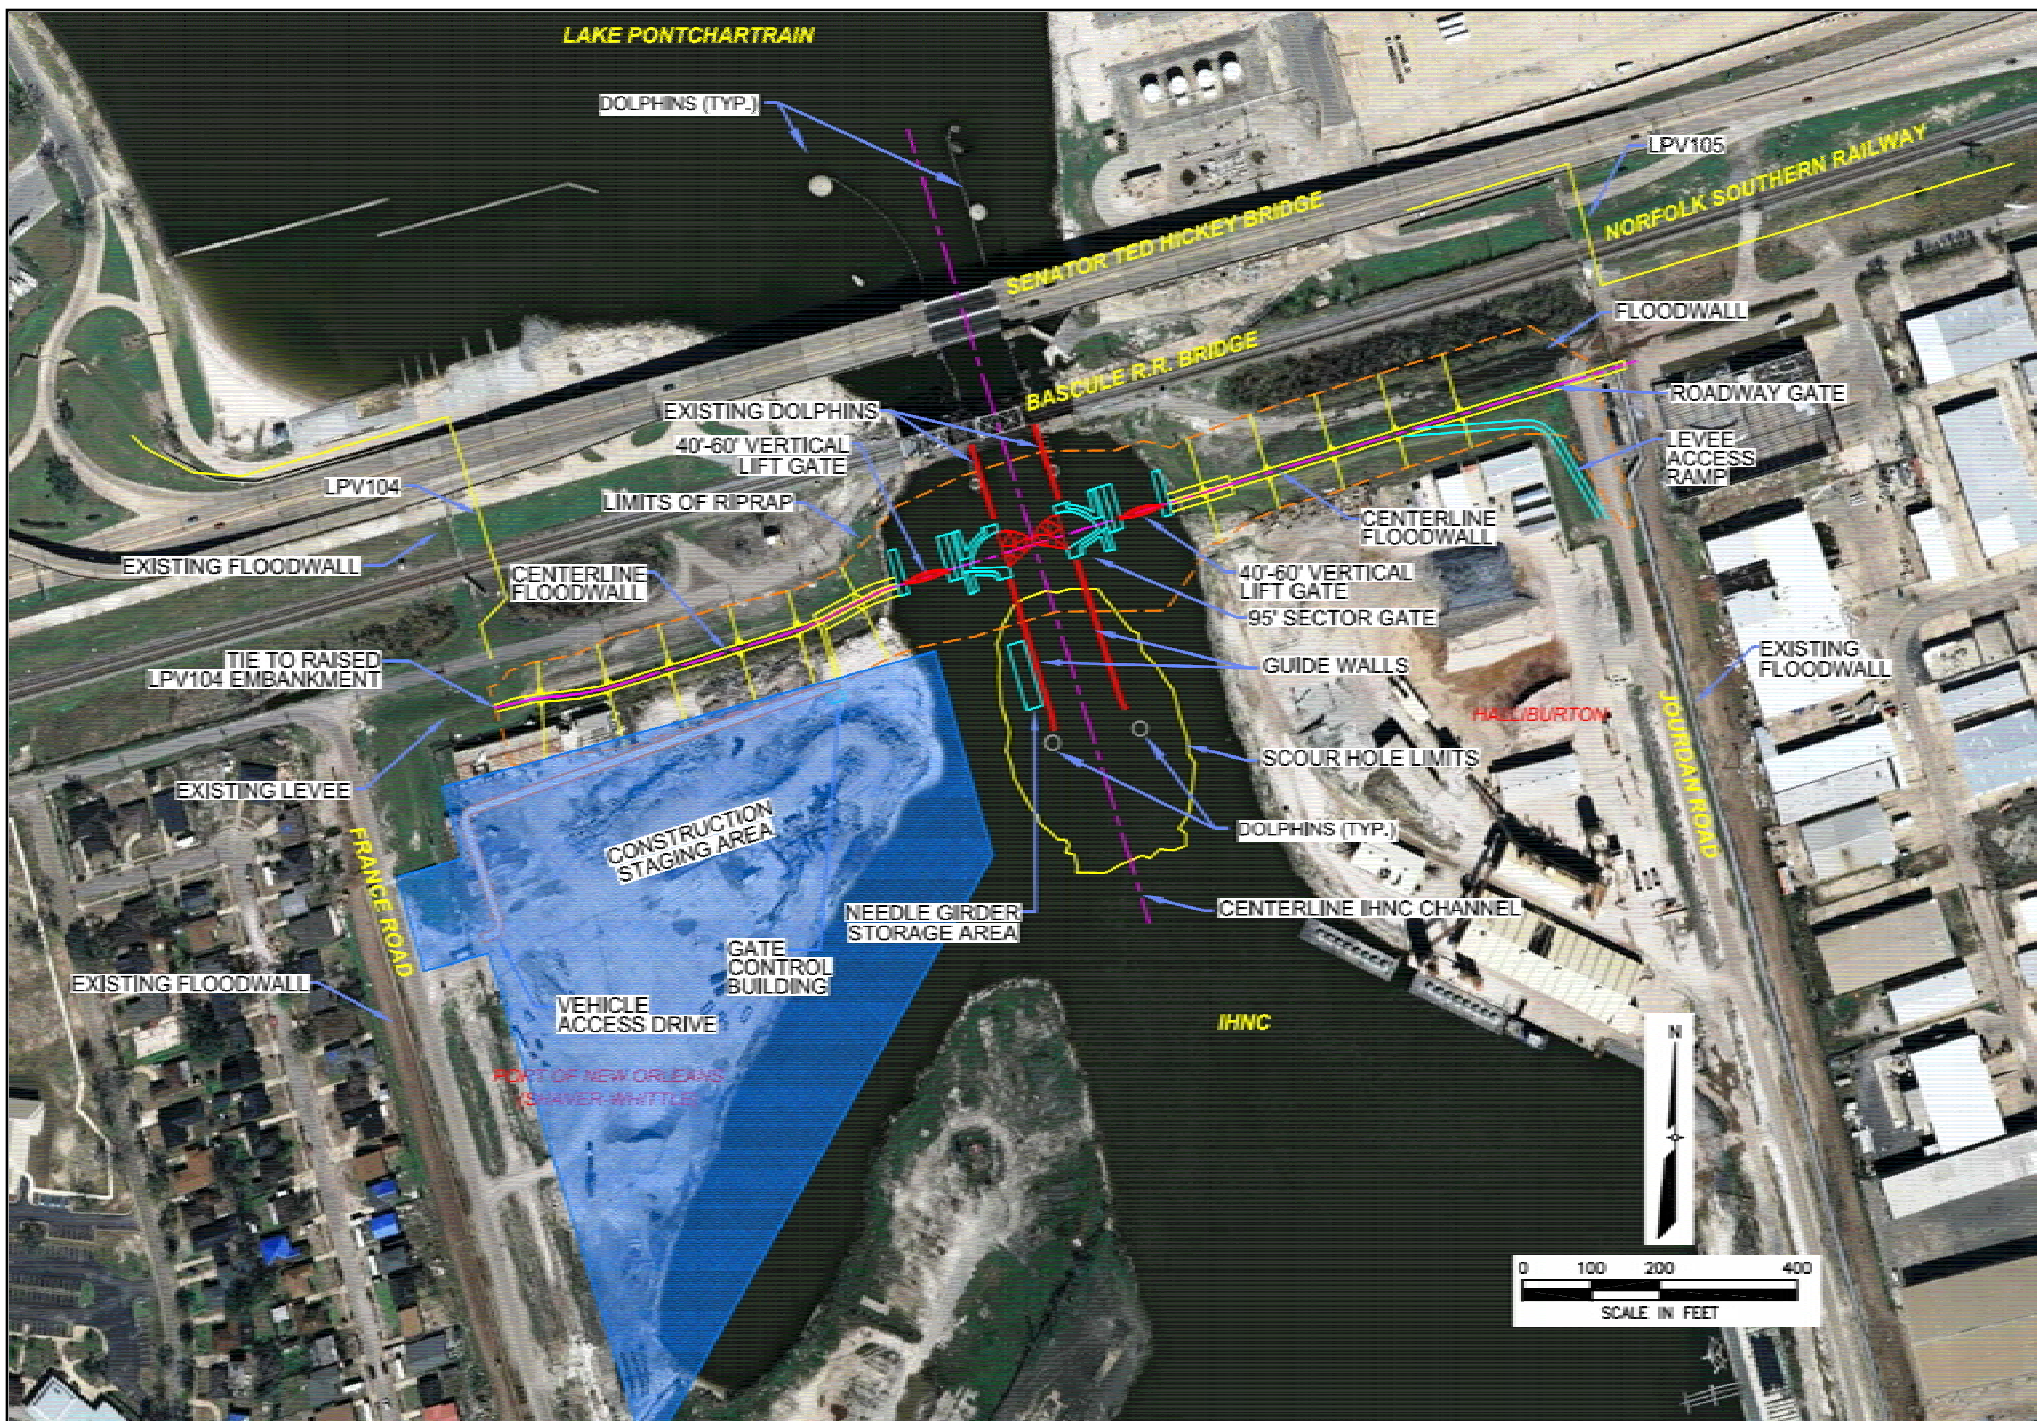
Diagram of Alternative #2 - Bridgeside Alignment 398 ft south of Seabrook Bridge
